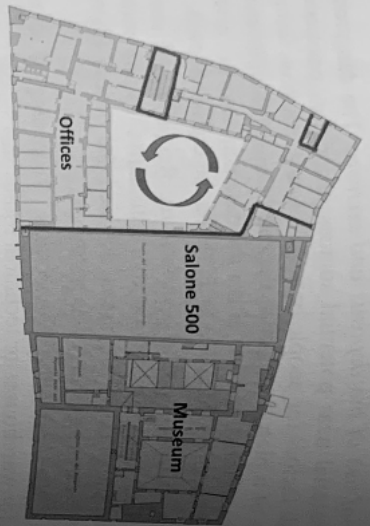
example of the fire prevention masterplan at the third floor of the building.
